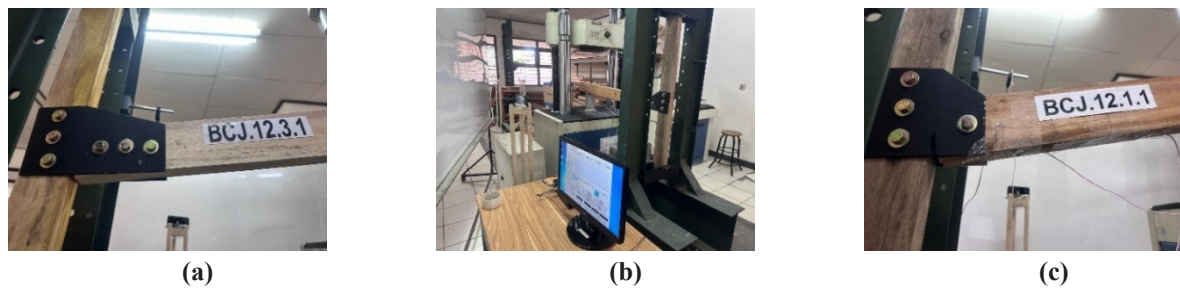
Setup, Testing, and Post-Test of the Beam-To-Column Specimens Using 12 mm Diameter of Bolt. (a) Setup of the Specimen. (b) Testing of the Specimen. (c) Post Test of the Specimen.
